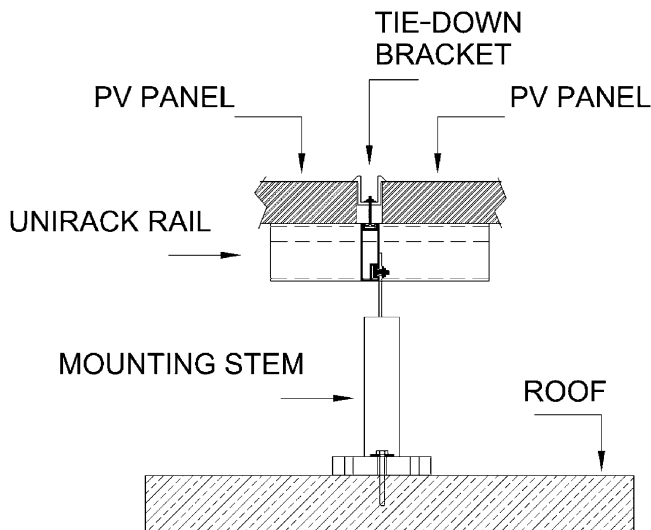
Typical roof-mount solar power installation detail. *Courtesy of Vector Delta Design Group.
